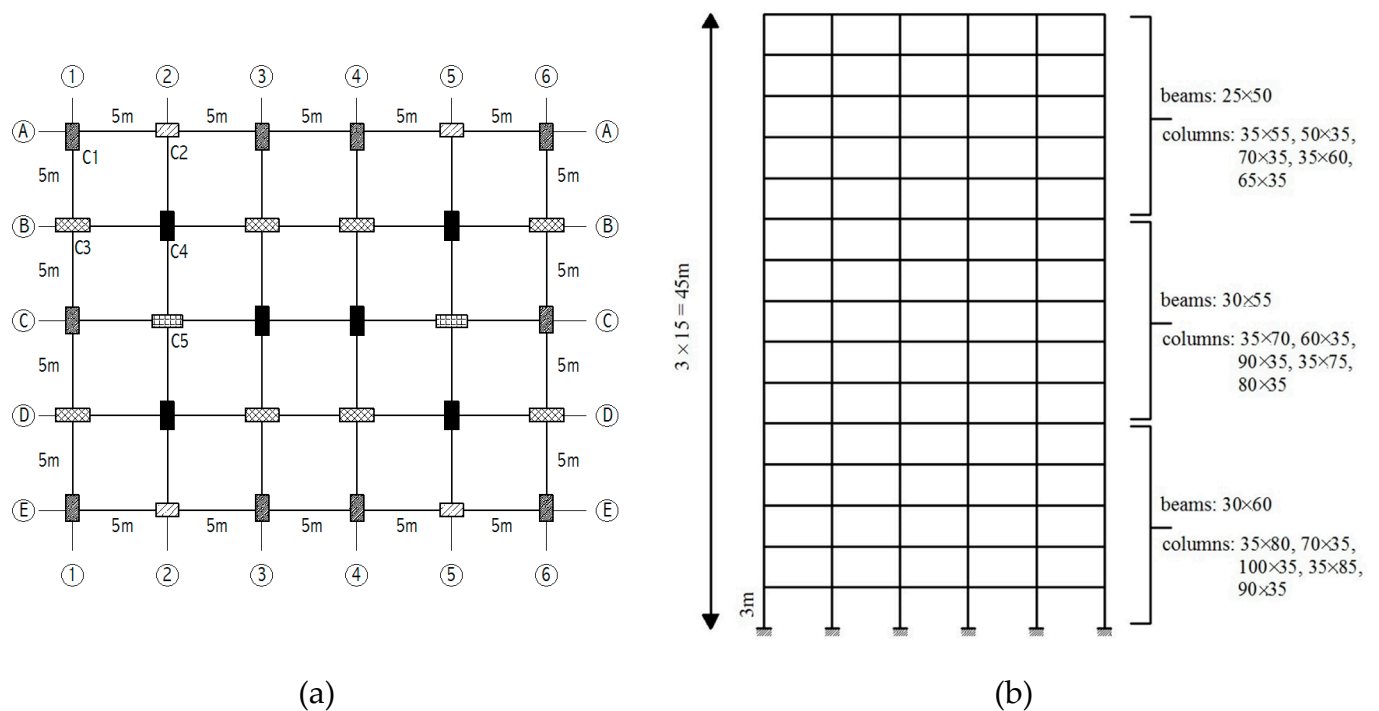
(a) Plan views of first floor of 15-storey building, (b) elevation view.
